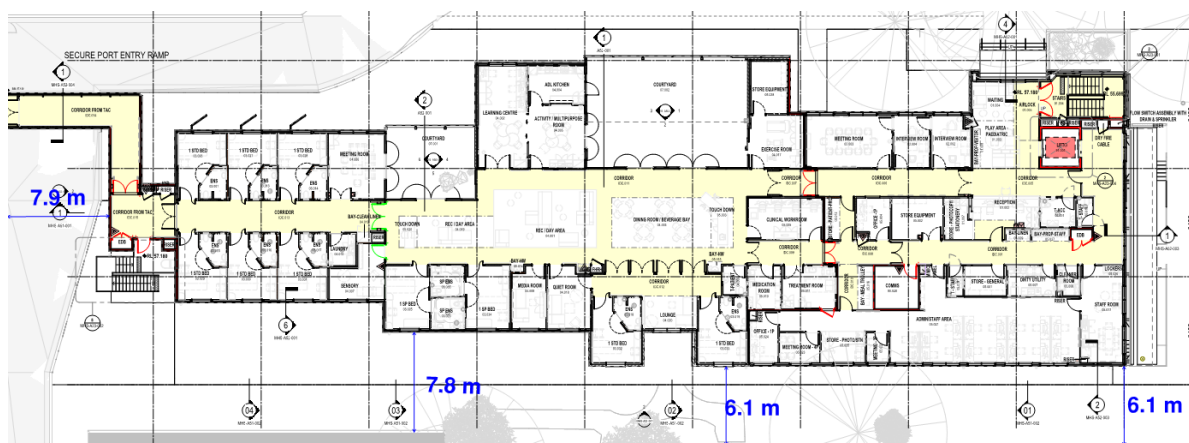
Distance of proposed CAMHS Building from existing Adult Mental Health, Nepean Executive Building, Sexual Health Building, and proposed TAMs Building
